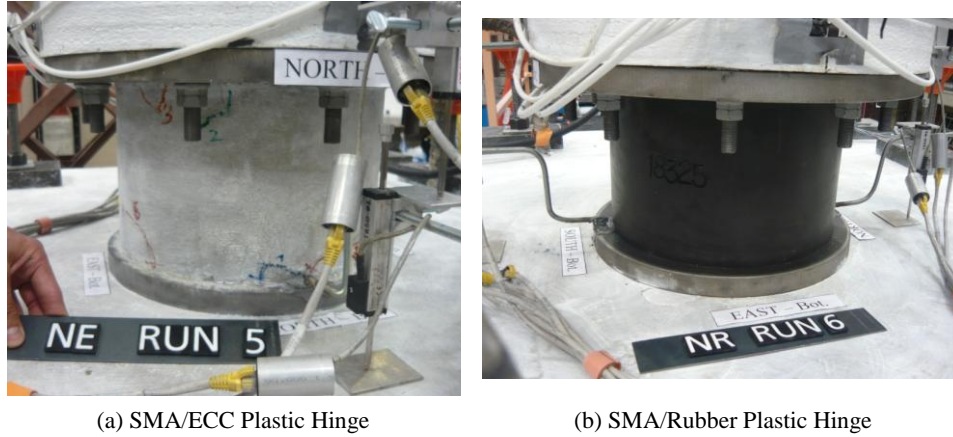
Damage of detachable bridge column plastic hinges under 200-250% design earthquake
